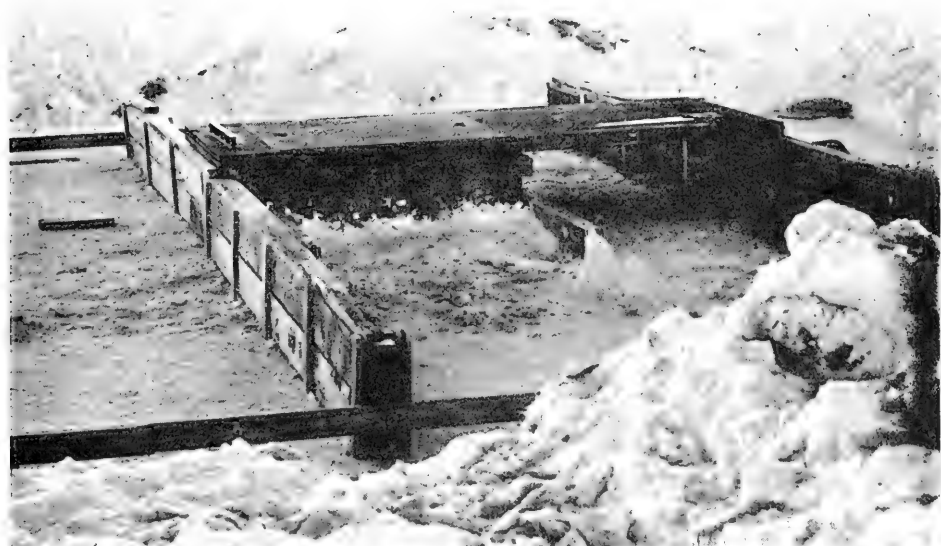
PLATE XI. FOUNDATION BEAMS AND FIRST FLOOR PANEL OF THE ICEHOLE
